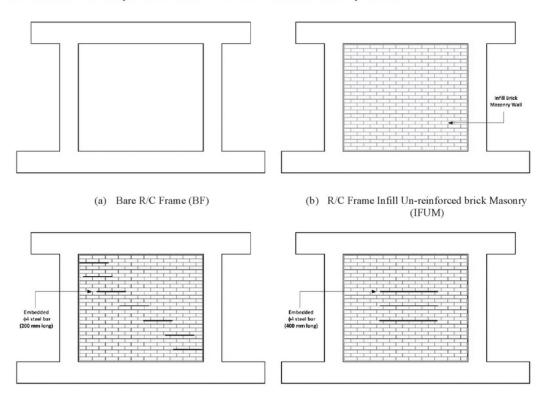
Geometry and Reinforcement Details of the R/C Frame
